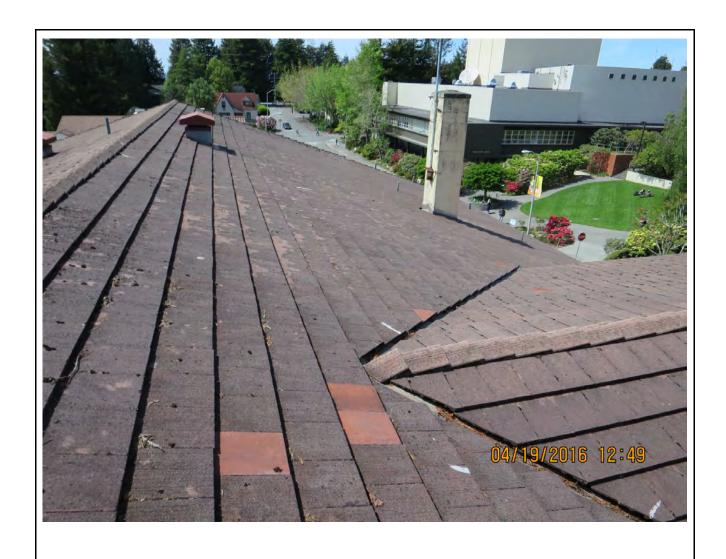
The roof is covered with concrete tile over tar paper and rubber-like roofing
